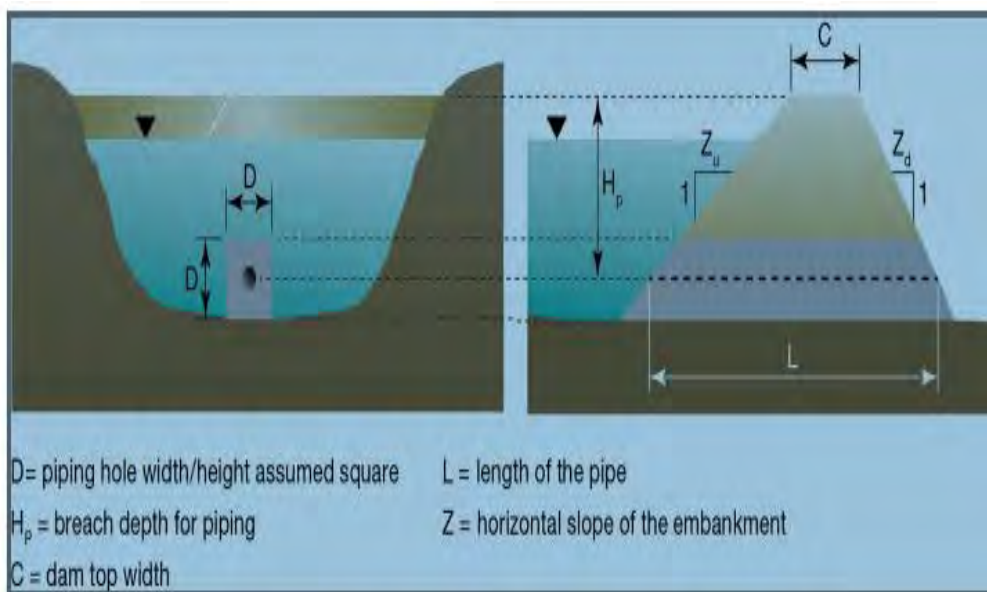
piping hole (Colorado Dam safety branch, 2010)
